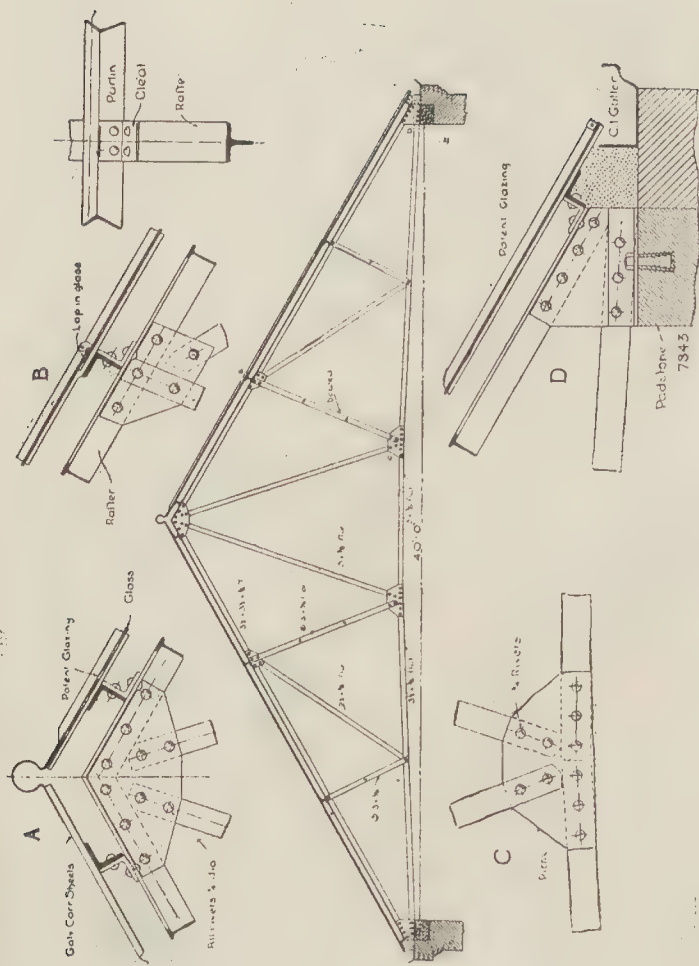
Steel Roof Truss of Right-angle Strut Type,
